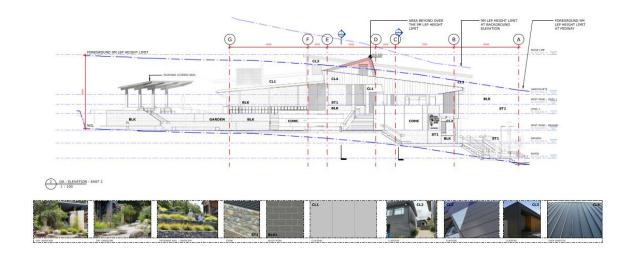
Proposed Material and Colour Schedule for the proposed learning building and perspectives of the building when viewed within the school grounds.
